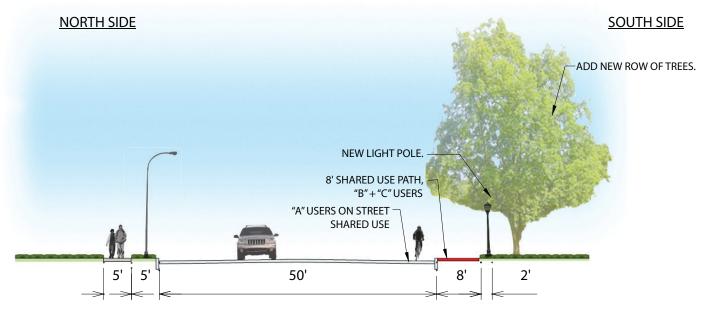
The Hub: Zone 2 Industry Road Proposed Cross-Section
